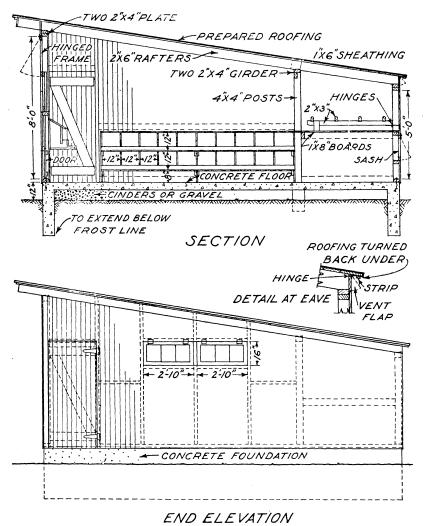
Section and end elevation of large shed-roof laying house shown in Figures 9 and 10
